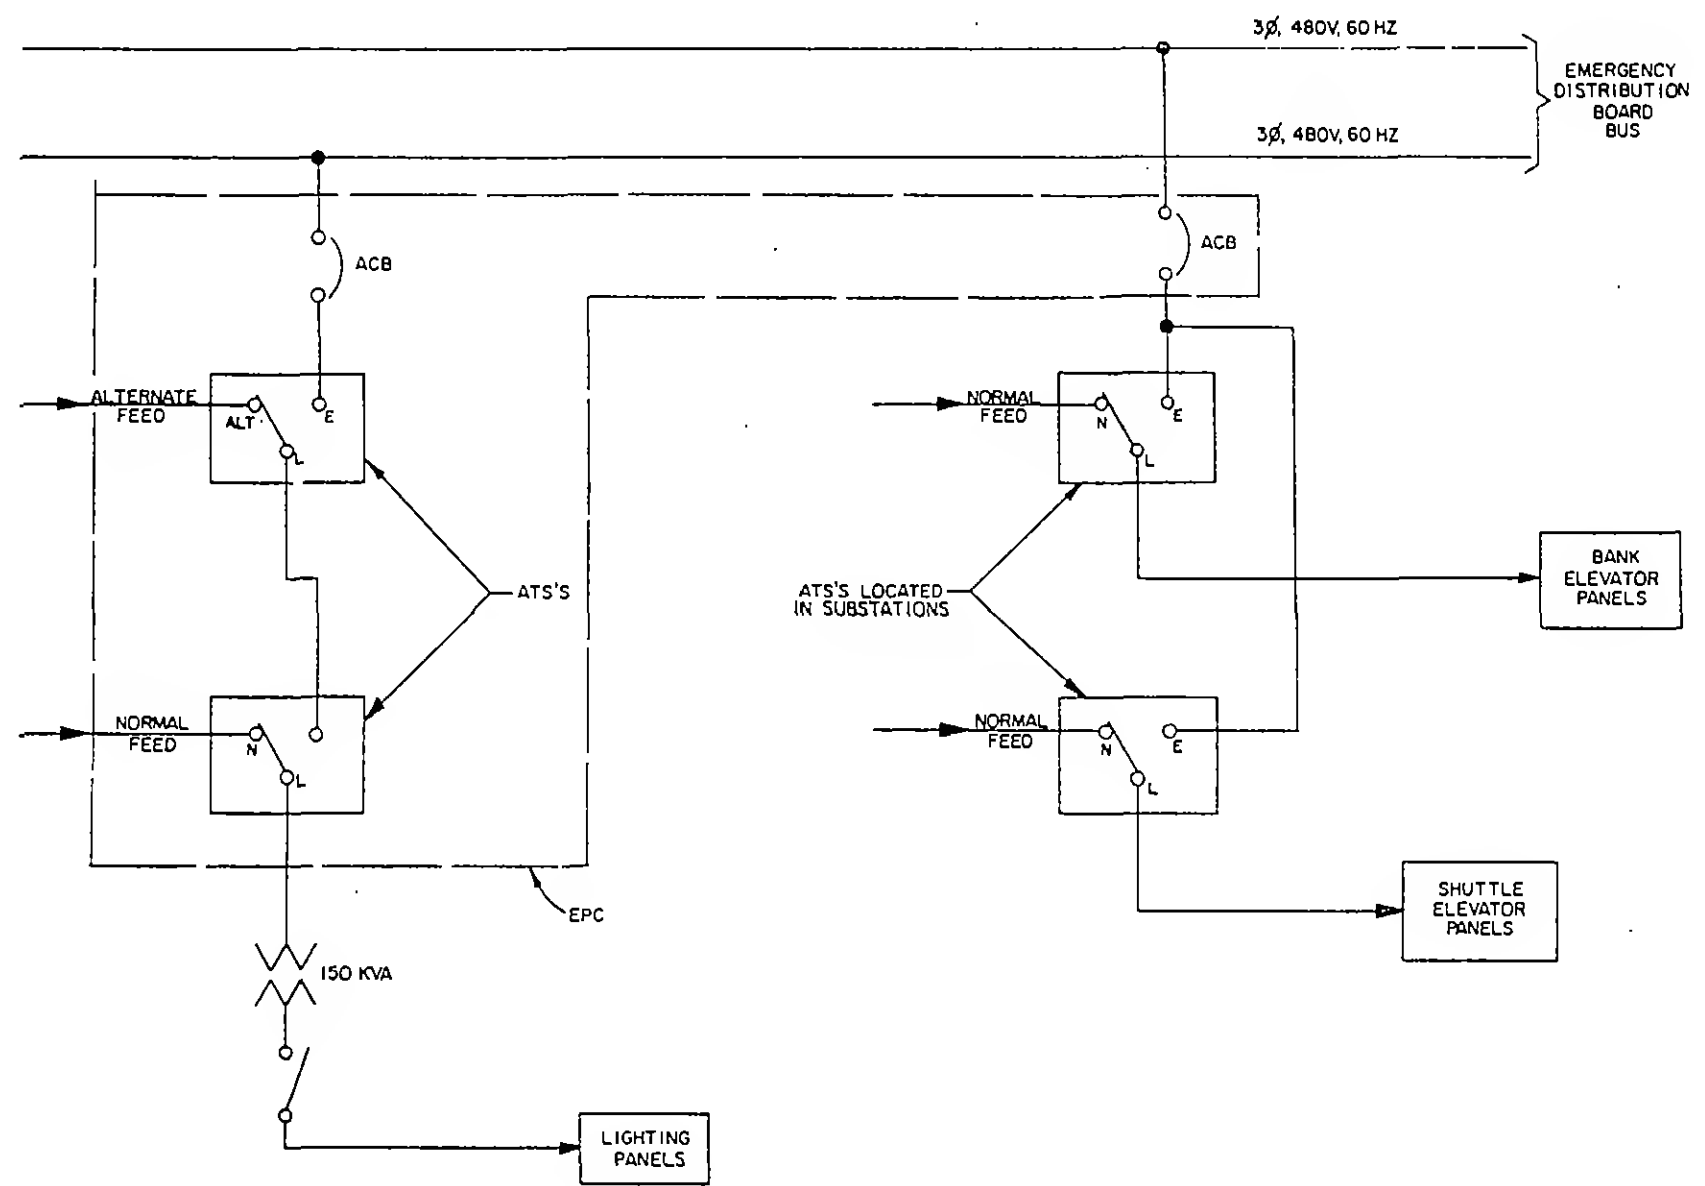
and 4.20 provide information on manual transfer switches (TS) located in the subgrades and in the 41st floor EPC of the North and South Towers. The ATS that are part of the lighting panels and Fire Department Elevator provide both an alternate and emergency source of power when normal power fails.
